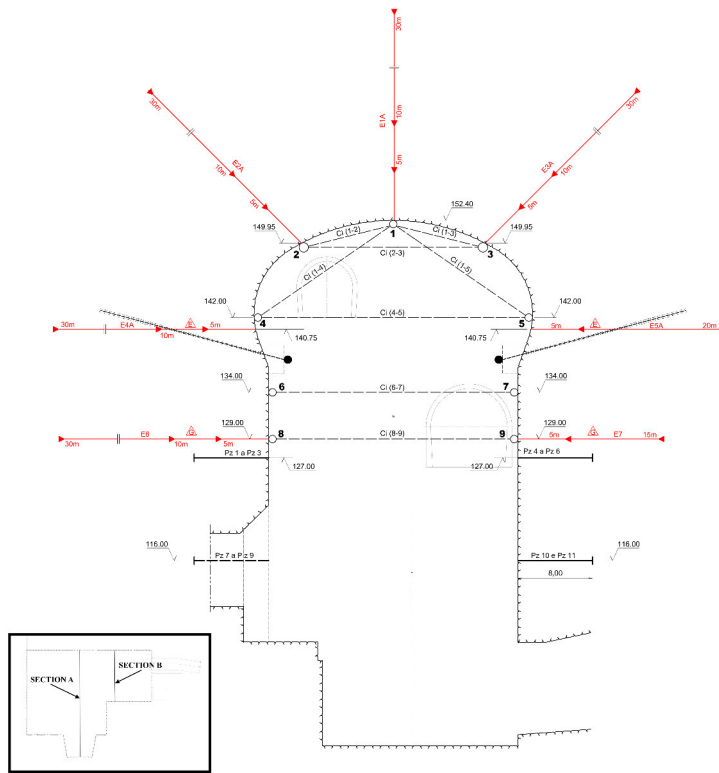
Cross section of the powerhouse cavern showing the monitoring plan adopted (adapted from EDP (2009)).
